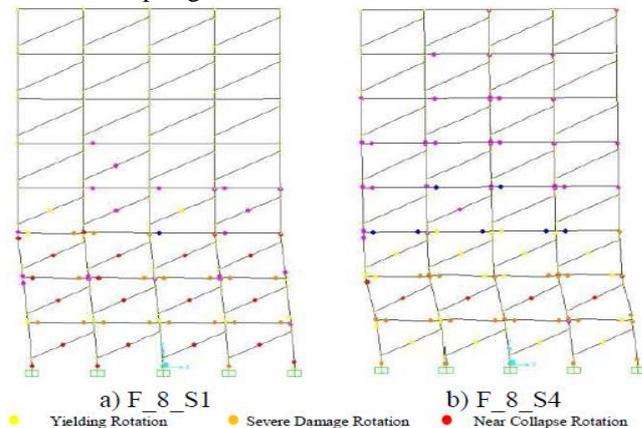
Collapse Mechanism of Infilled Frames with H=28m
